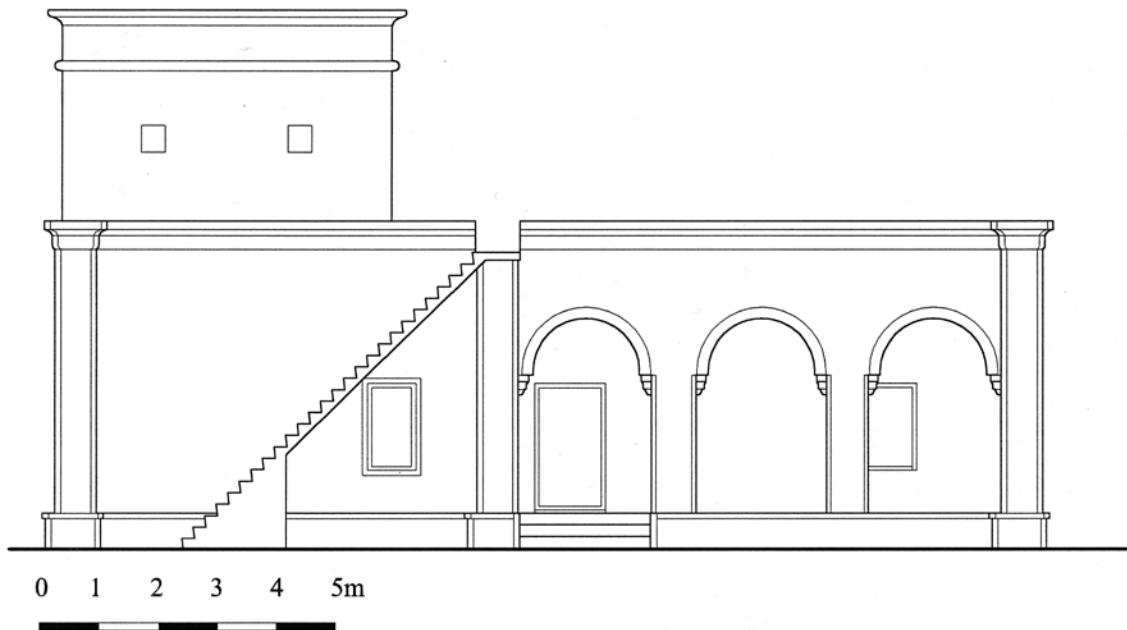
Fire temple, east elevation showing the arcaded portico (d) with the door to a hall (c) and the window to the domed chamber (e) as well as the steps to the roof and above the roof the eastern façade of the chamber enveloping the dome of the larger chamber (i).
